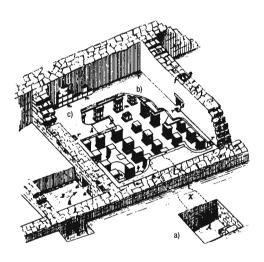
Roman hypokaust heating system a) fireplace outside the building, b) cavity floor, c) flues (tubuli)
